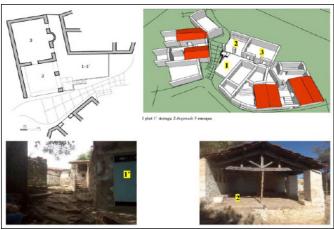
Plan and views of the *thajmaât* in Moknea. (Source: Author)
